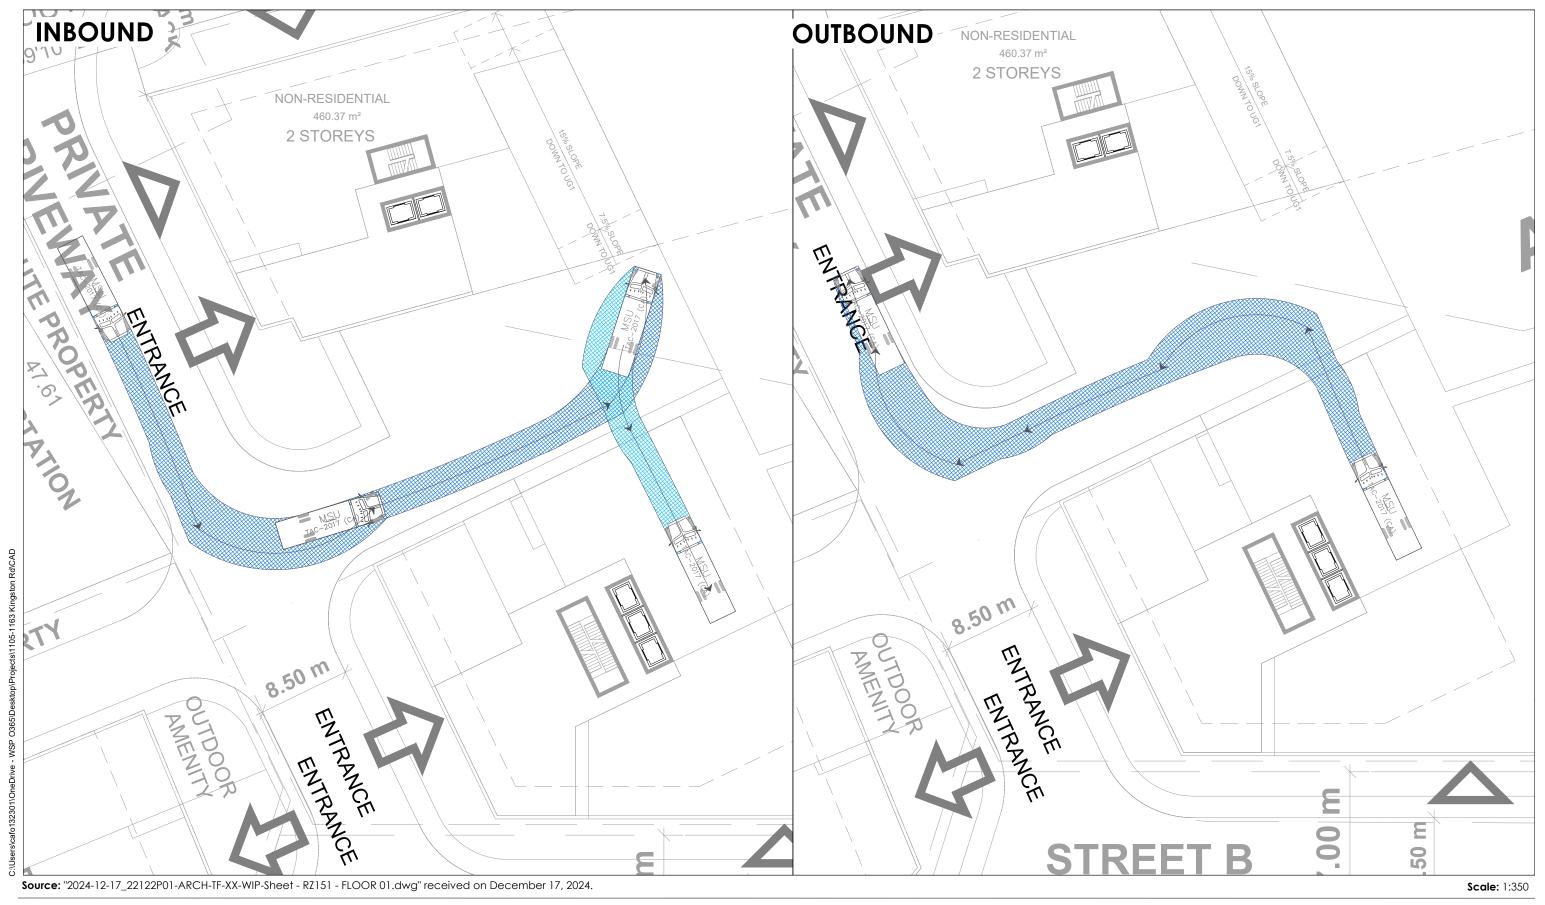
MSU Loading Truck Turning Maneuver - Building A 1105-1163 Kingston Road, Pickering
